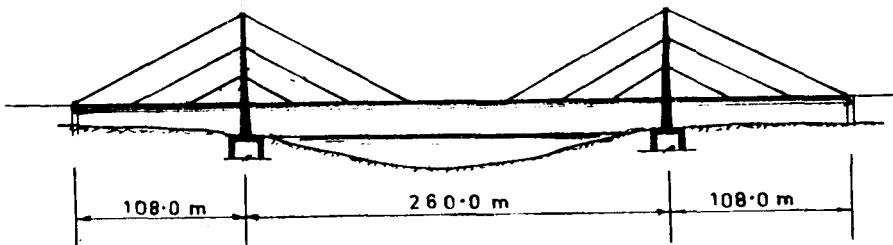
NORTH BRIDGE AT DUSSELDORF
